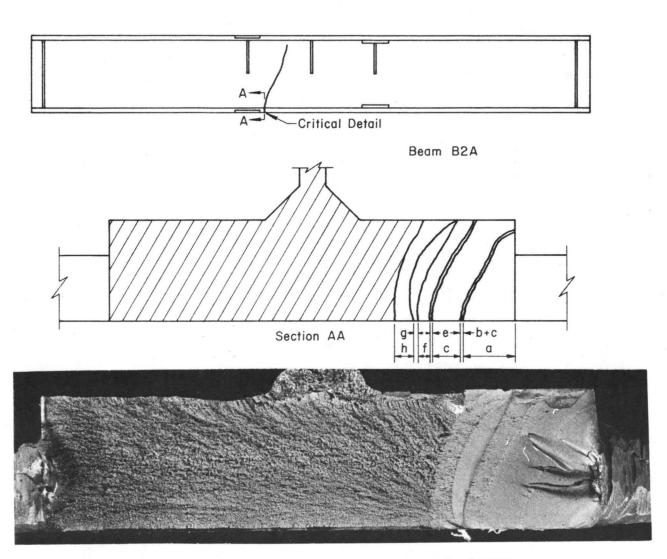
Fatigue and Fracture Surface, B2A (A514)
